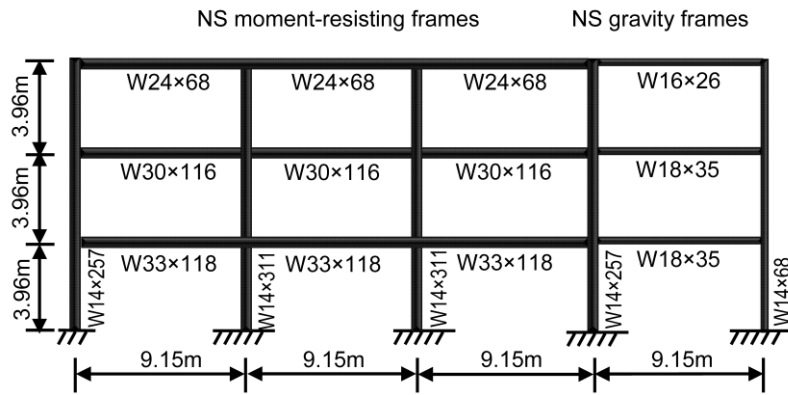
Elevation and member sizes of the LA 3-story Frame.
